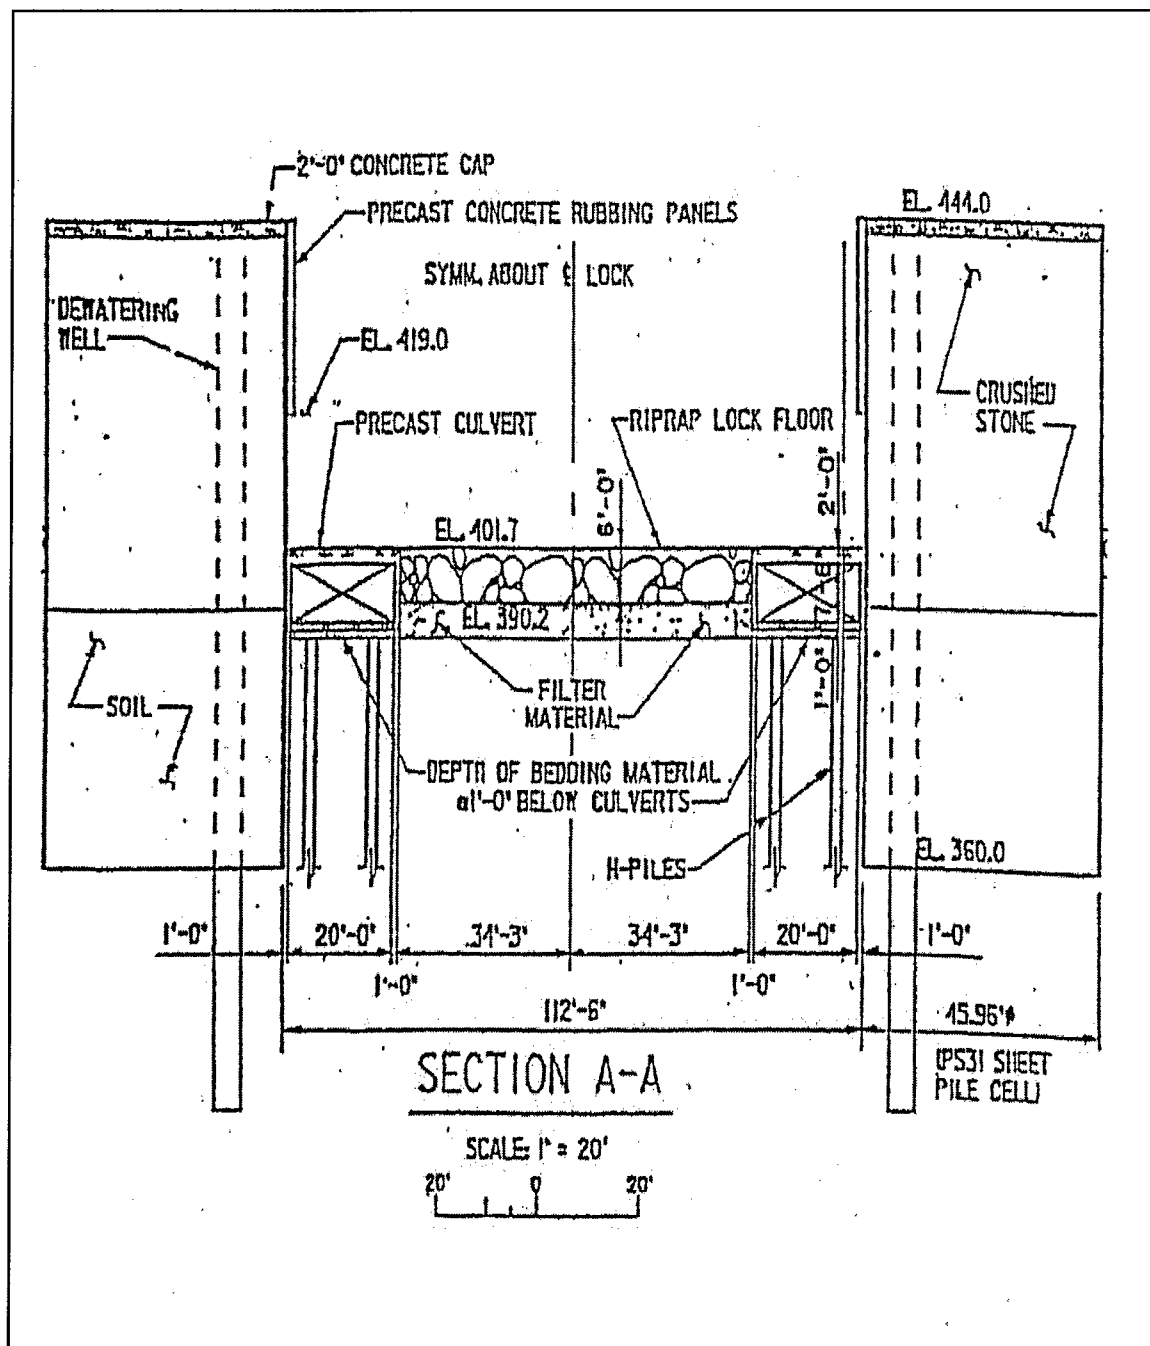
Plan 5, section of cellular lock walls with culverts in chamber
